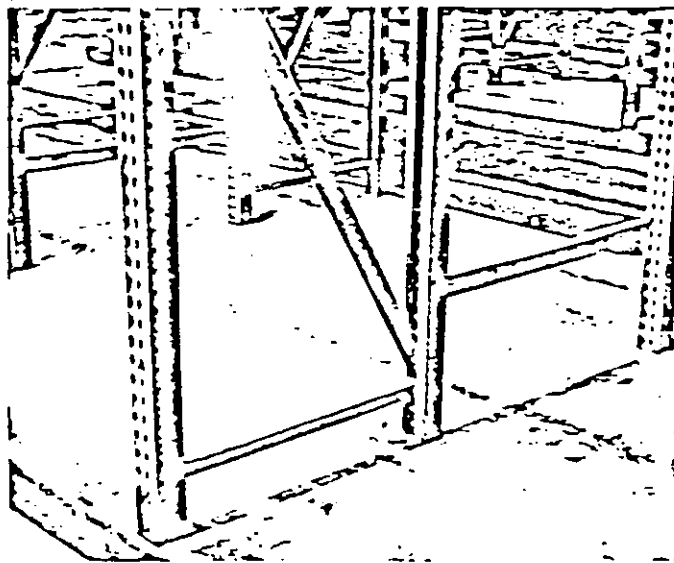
Loaded legs supporting high-rack storage must have base plates of adequate size to prevent bearing or shear failure in the slab.
